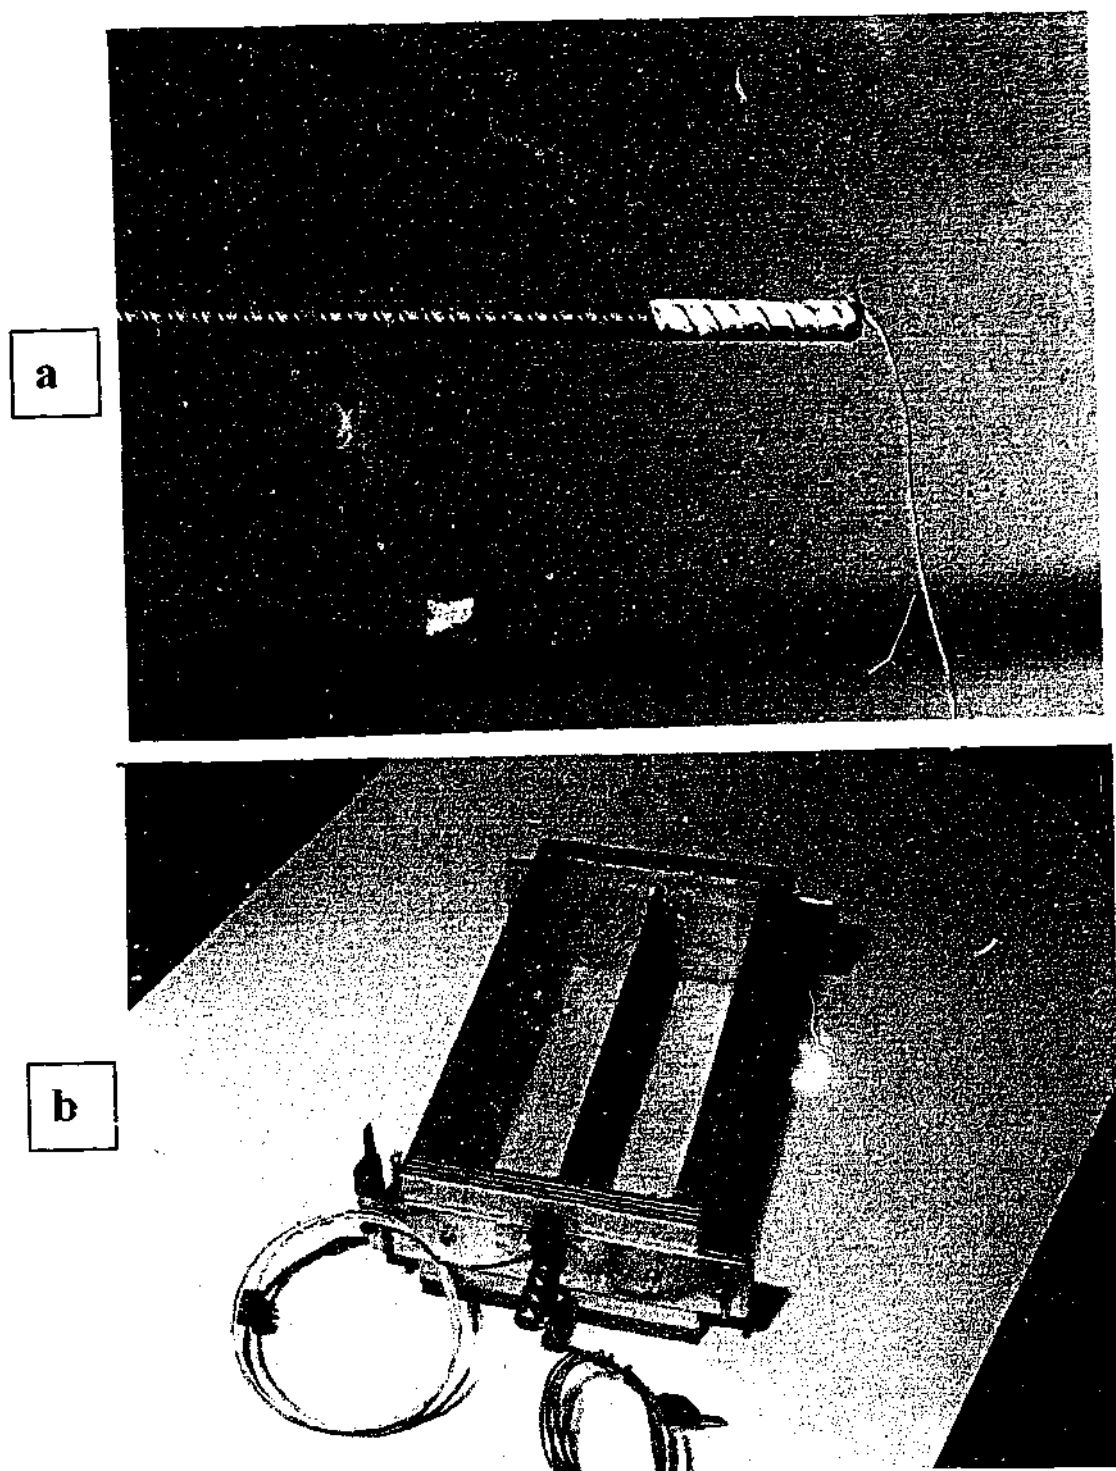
(a) A representative rebar and (b) a wooden mould containing a rebar and an internal anode
